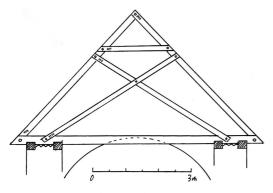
Section of the roofing in Marbäck. A merger of Romanesque and Gothic traits. The tie beam is still in use but instead of strut beams we find scissor beams and the double wall plates, which are usually connected with rafter foots. Each part is numbered. Drawing by R. Gullbrandsson.
